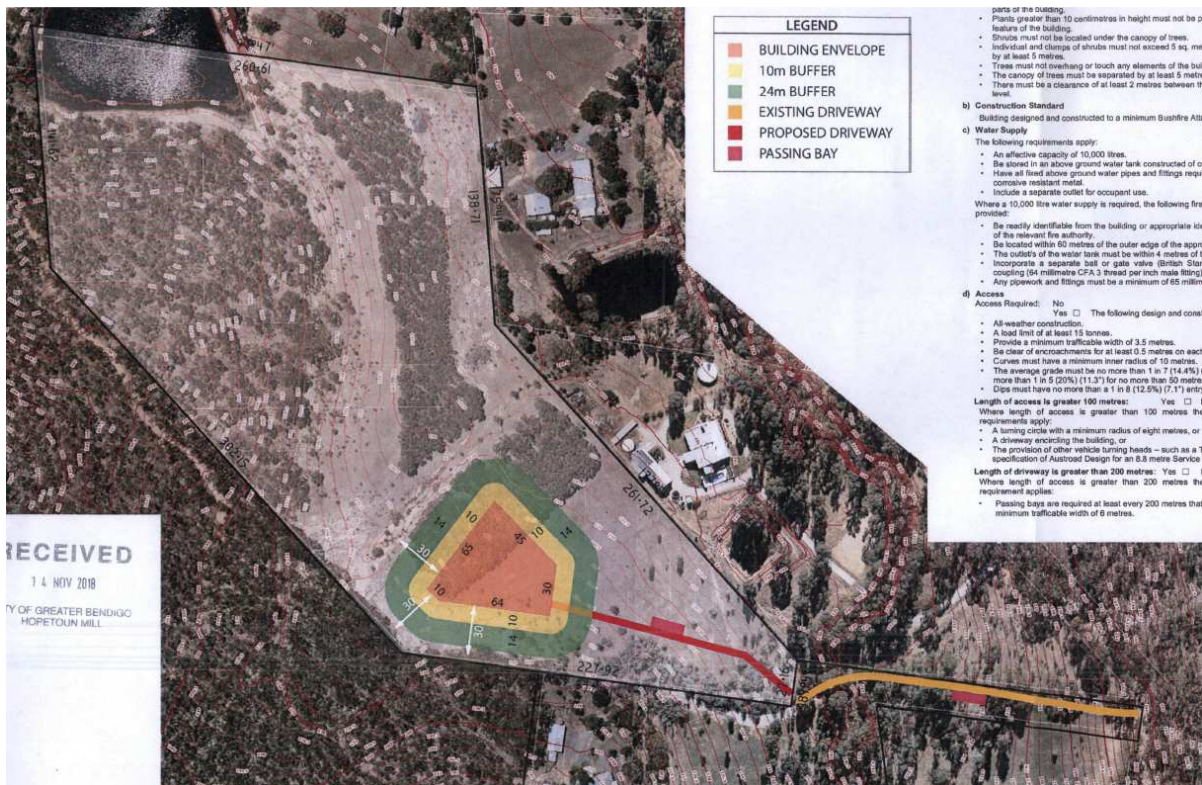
Site layout plan showing location of the building envelope, defendable space, driveway and carriageway easement
